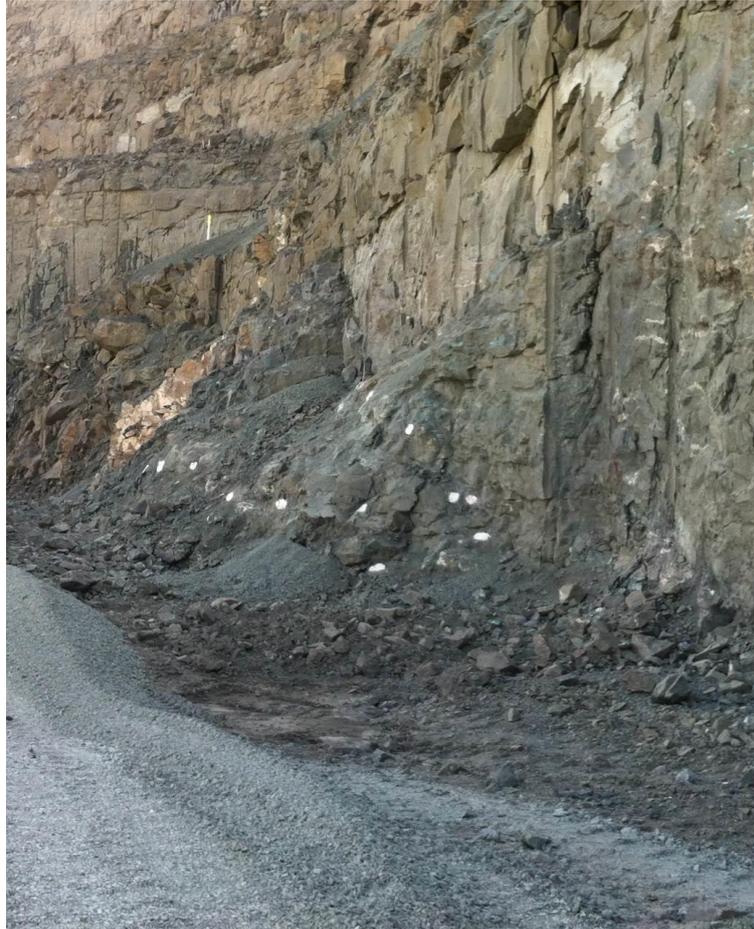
Final wall – attempts made to remove the frozen ground from a poor trim blast against the pre-split, which can result in further damage at the toe of the slope
